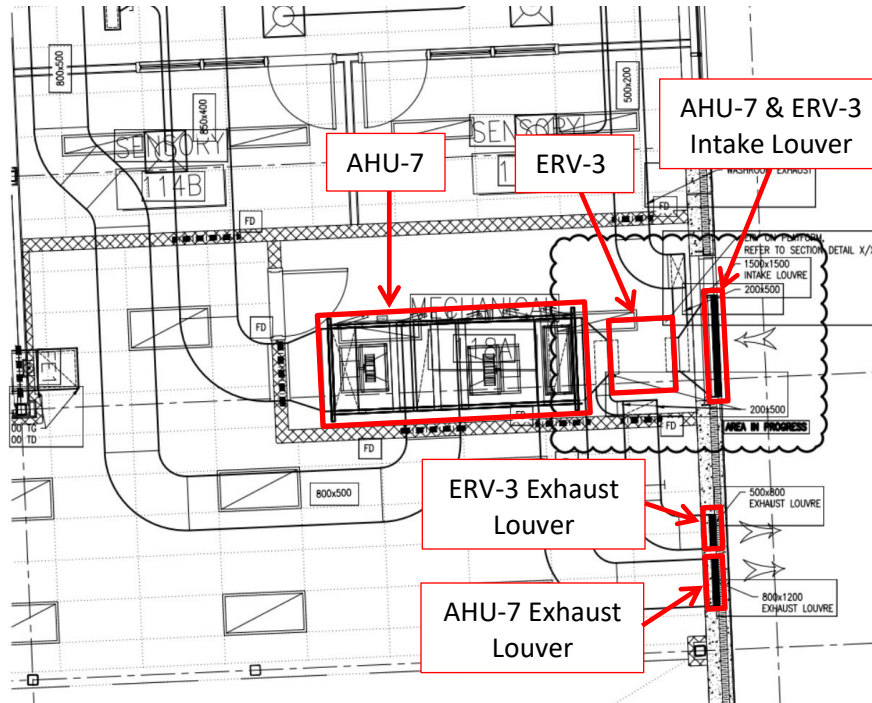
First floor mechanical room plan showing location of considered equipment.
